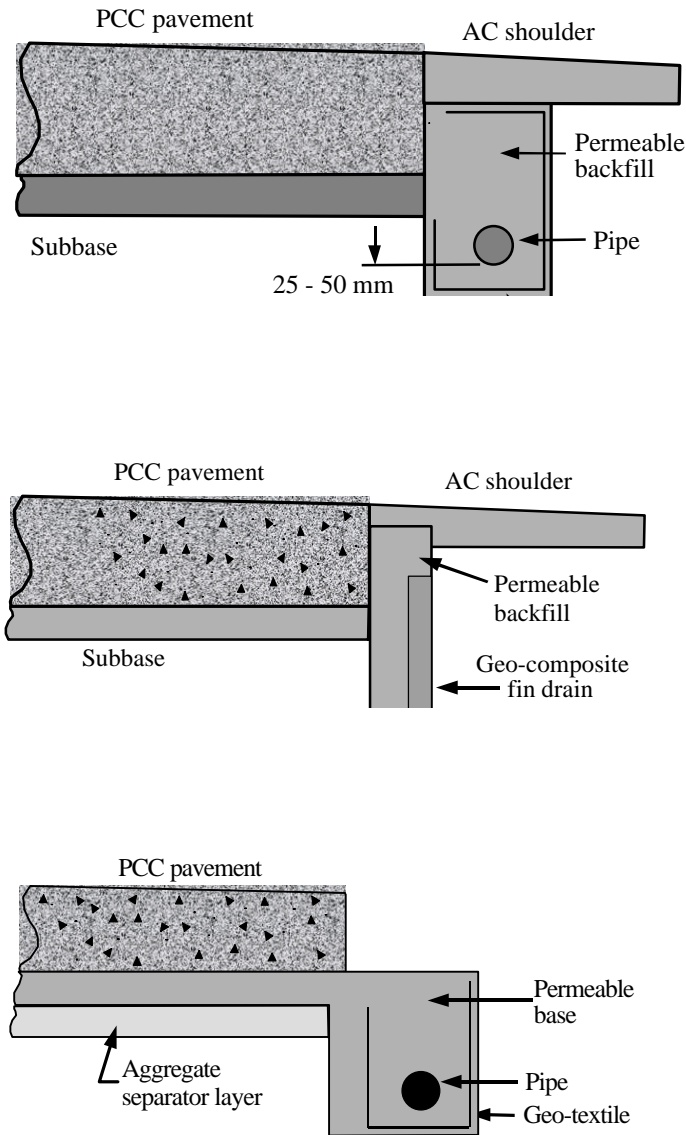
Typical views of pavement subdrainage features, including longitudinal edge drains and permeable base layers.
